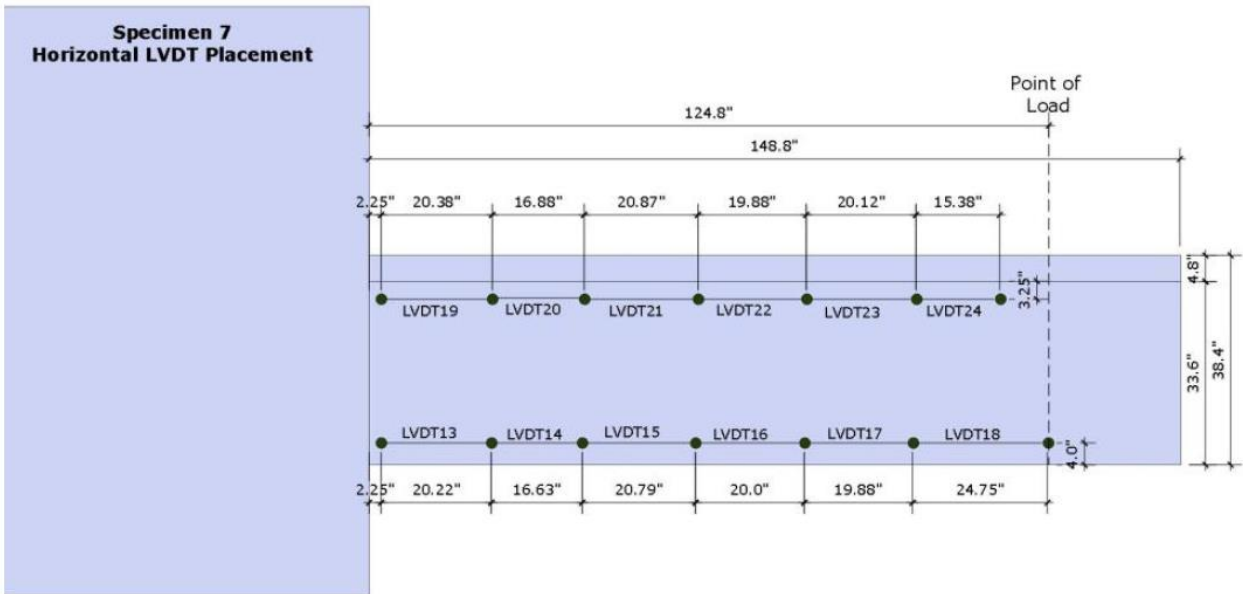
Layout of horizontal LVDTs on Specimen 7 (Lemnitzer et al., 2013).
